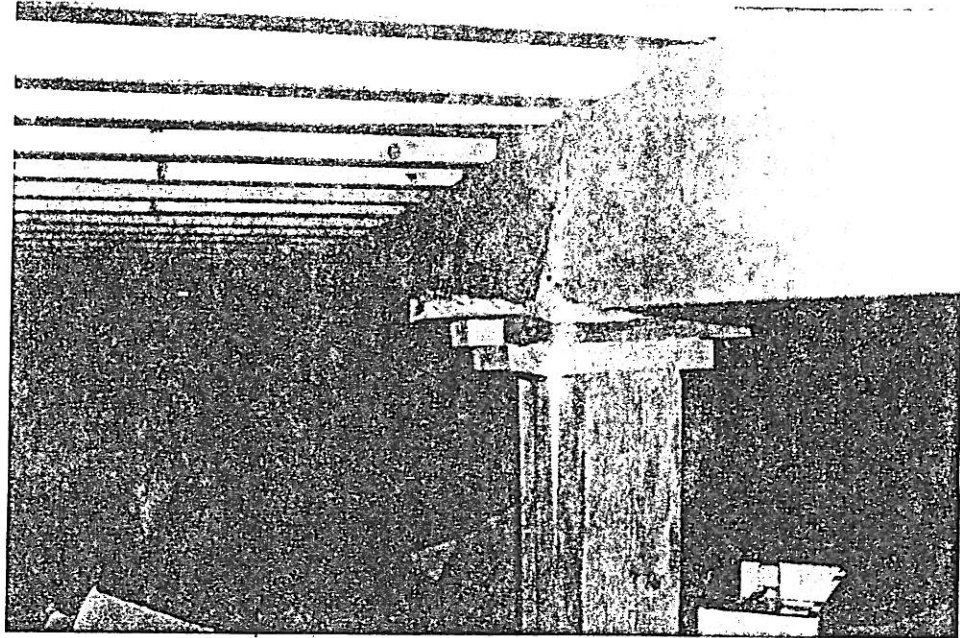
MAIN BEAM SUPPORTING FLOOR JOISTS. NOTE TWISTING DUE TO SHIMMING AND LACK OF LATERAL RESTRAINT.
